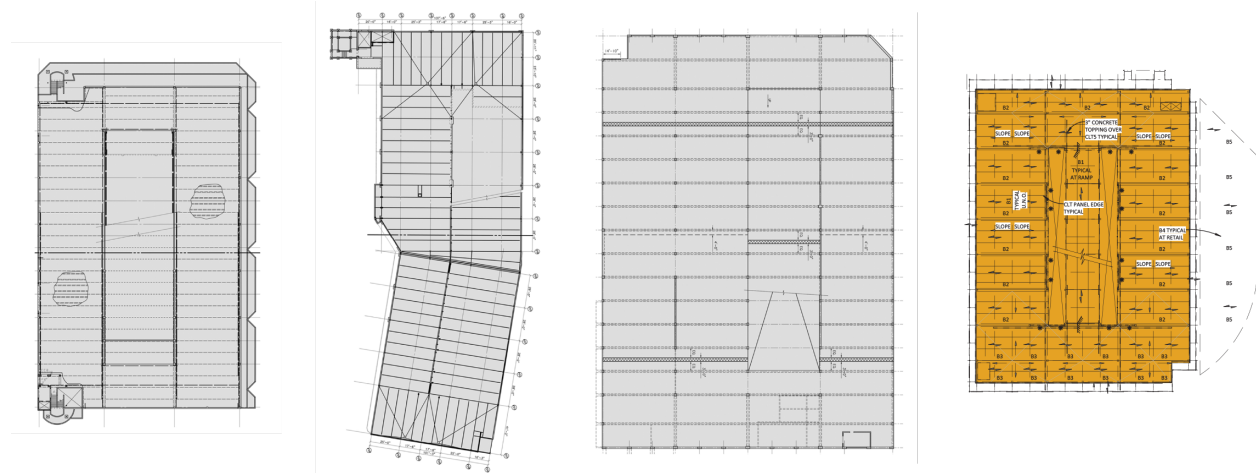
Plans at the same scale of the case study parking garages (left to right): precast concrete, cellular steel, post-tensioned concrete and mass timber
